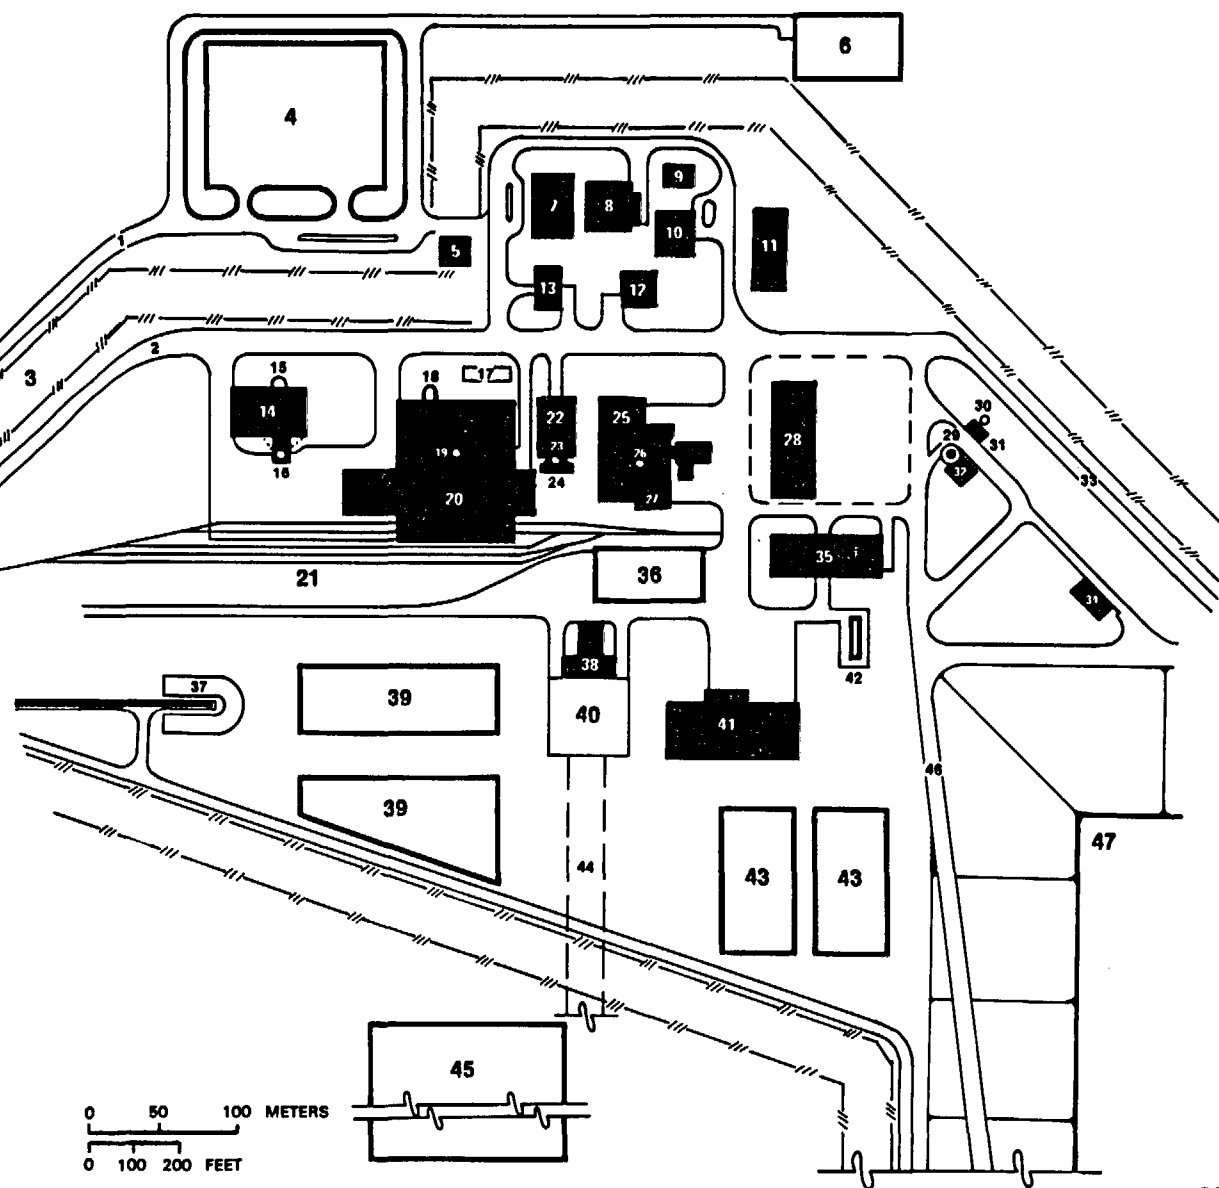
Surface Facilities Plan--Central Process Area.
